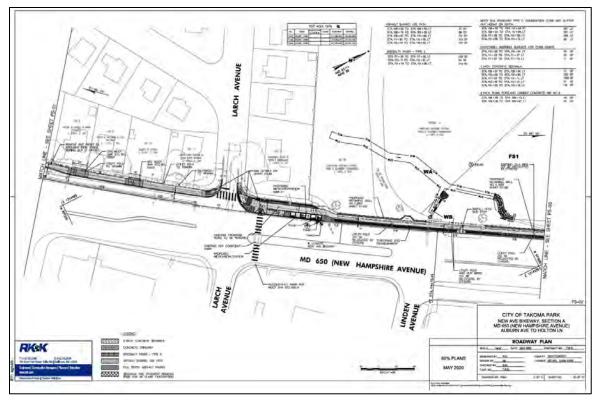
Plan View of Proposed New Avenue Section A Improvements (Part 2)
